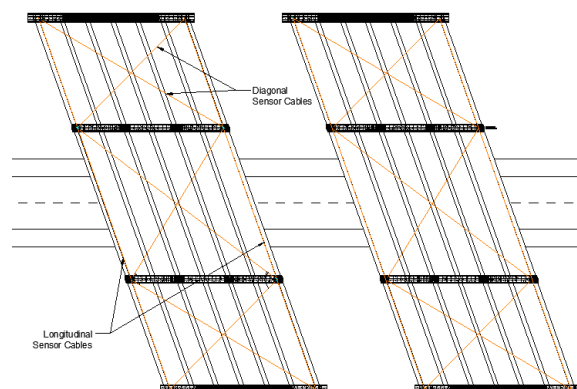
Longitudinal and Diagonal Sensor Cables Suspended between Outer Piers and Abutments
